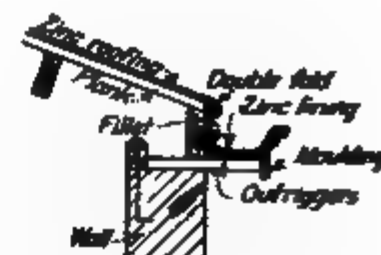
Eaves gutter, zinc roof (Lining must move freely on account of large expansion and contraction.)
